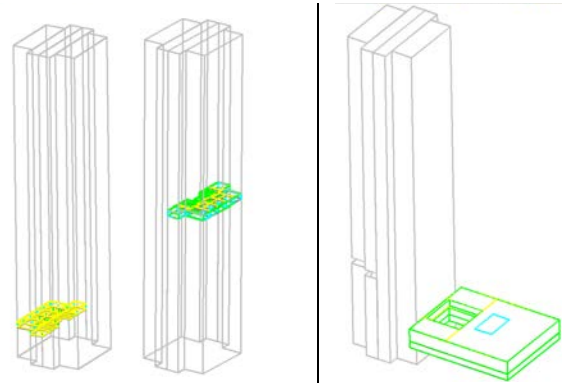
Examples of rotation and translation of half floor model: 5th floor West half, 26th floor East half.
